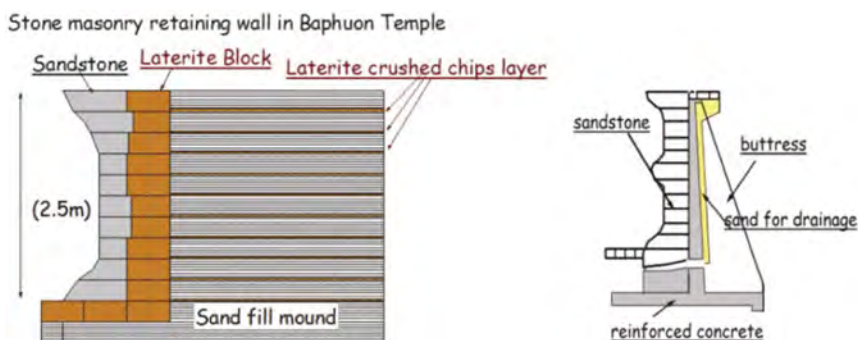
(a) Original masonry retaining wall, (b) Reinforced concrete.
